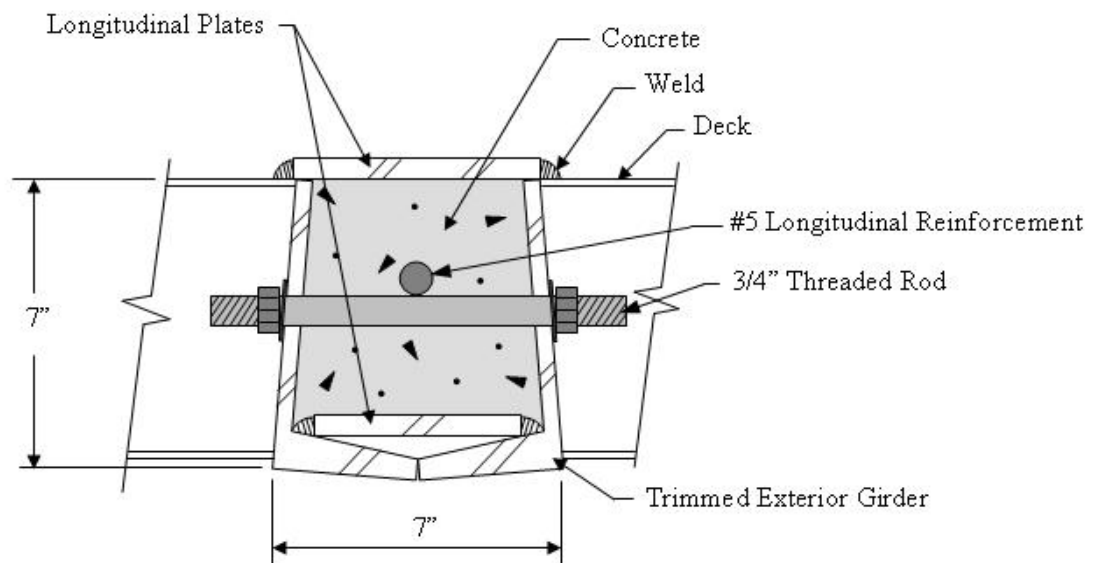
Type 2 longitudinal flatcar connection (timber planking not shown) (WCB1, WCB2, & WCB3)
